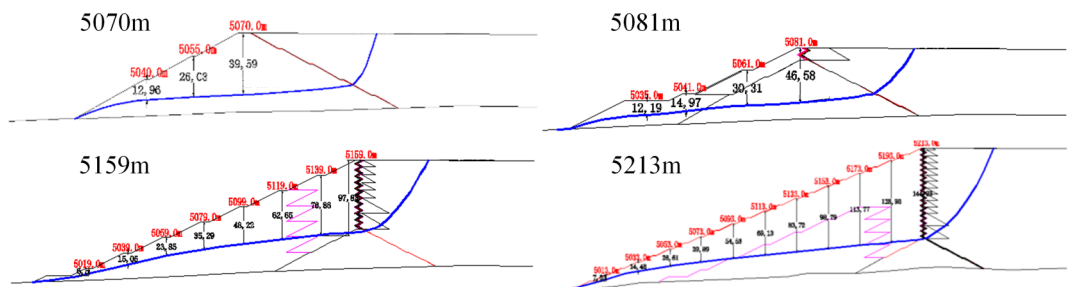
Geomembrane complete failure conditions at each elevation of the tailing pond infiltration line burial depth.
